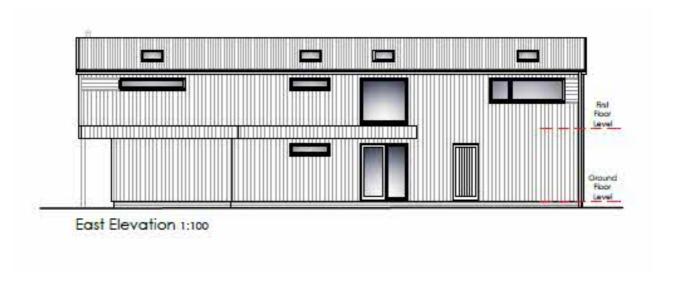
Excerpt from currently Proposed Planning Drawing Plans and Elevations, drawing number 21440, 02 G, by Vertex Architecture
